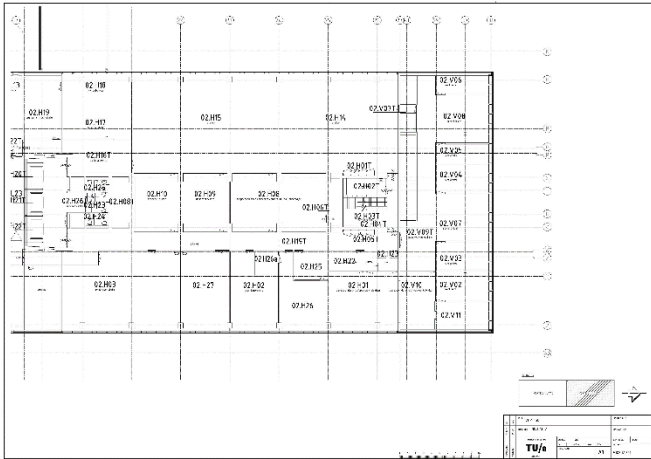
Floorplan of 2nd floor North side of the Vertigo.
